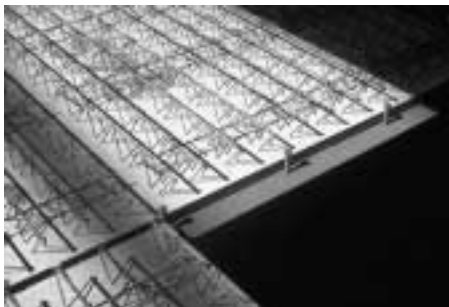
Biaxial trusses - panels engineered to suit project requirements
